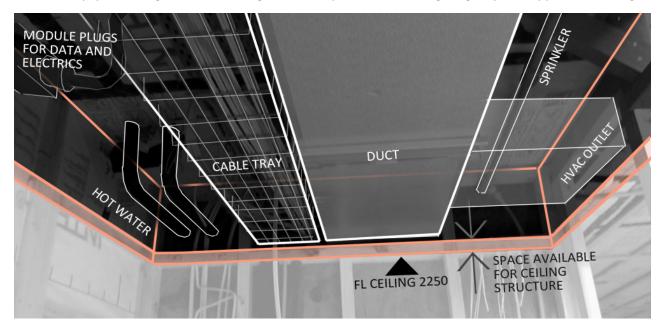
Photo during construction: the installed bulkhead services above the kitchen at the time the removable ceiling was being developed
